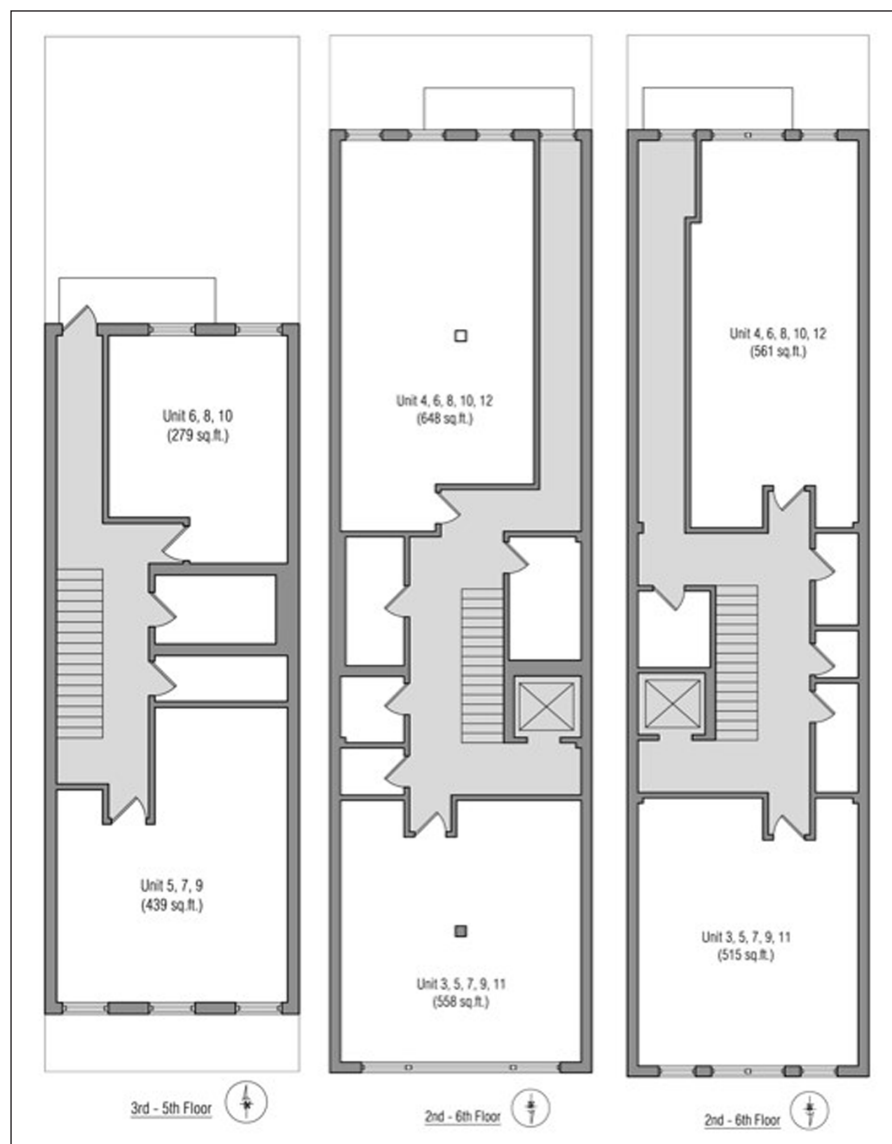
Non-ground-floor plans of buildings 7, 12 and 15 exhibiting an asymmetric core placement.
